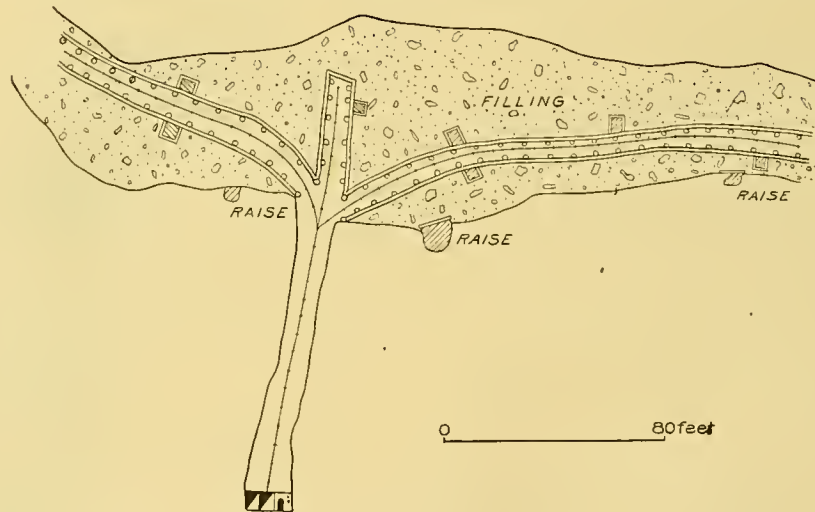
Horizontal section through the fifth level of No. 8 shaft, Soudan.
